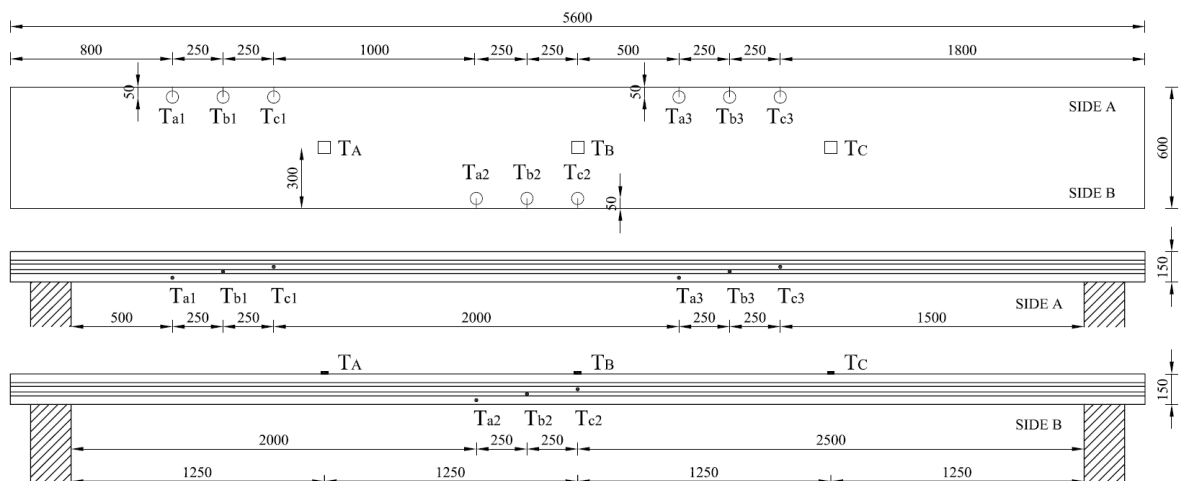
Plane view of loaded specimens S1 and S2 (top) and longitudinal cross-sections (middle and bottom) of specimen S1 with thermocouple layout (dimensions in mm).
